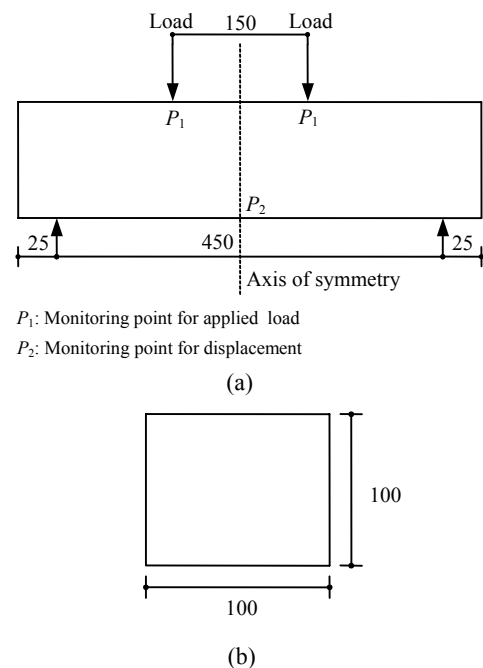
Dimensions and loading details of the analytical test specimen (all dimensions in mm). (a) Elevation; (b) Section
